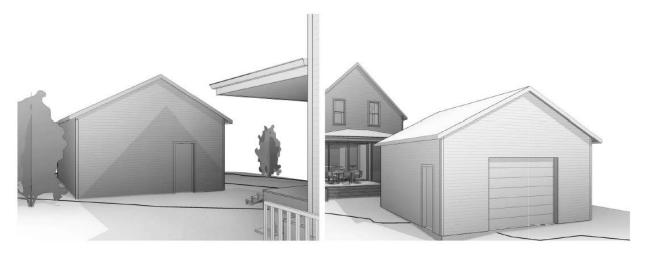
Proposed garage east and west (side) elevations. Not to scale.
